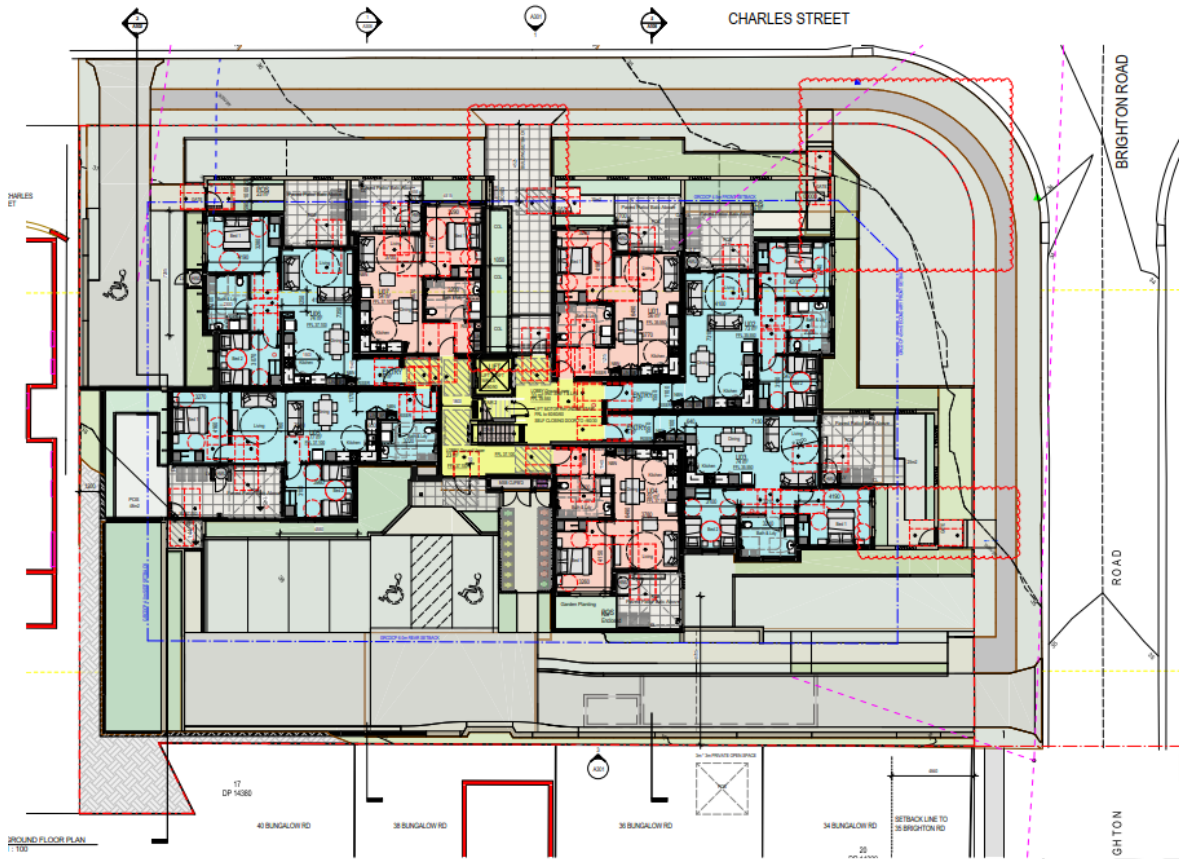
Extract from Architectural Plans – Ground Level (Source: Architectural Plans, SARM Architects, dated 20/10/2023)
